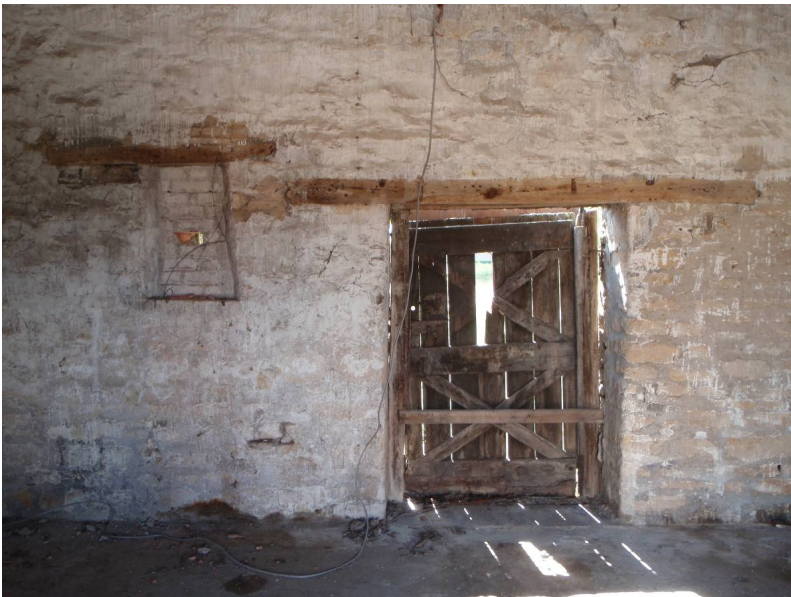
Interior of barn, south wall, showing detail of door and blocked breather slit, looking south
